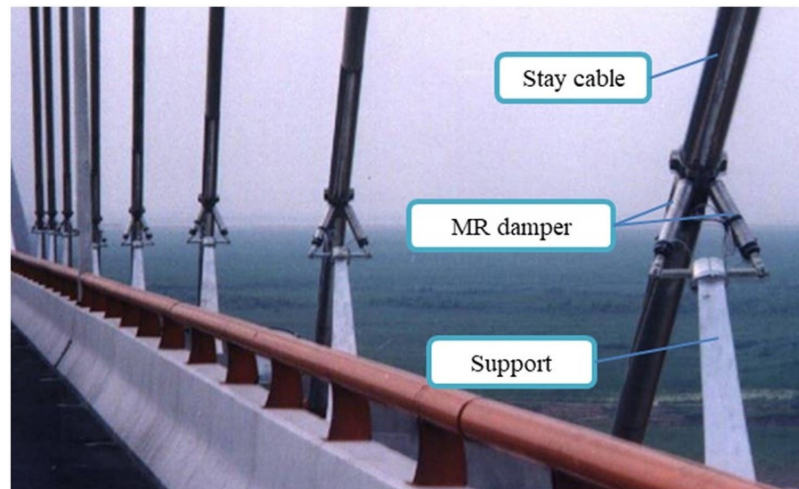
MR dampers installed in stay cable vibration control system on the Dongting Lake Bridge (Wang et al. 2018)
